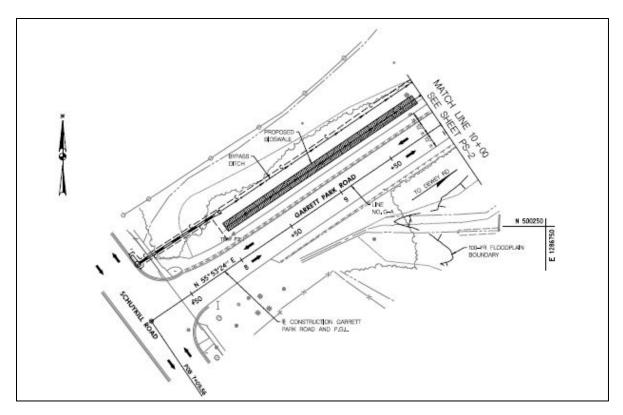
Plan View of Proposed Design Improvements (Part 1)
